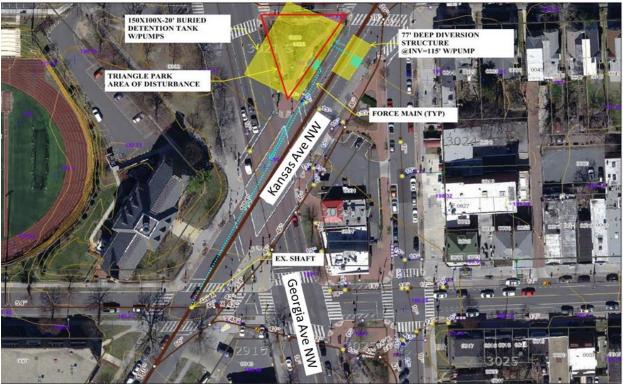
Upstream Storage Tanks with Pump Station – Storage Facility 02
